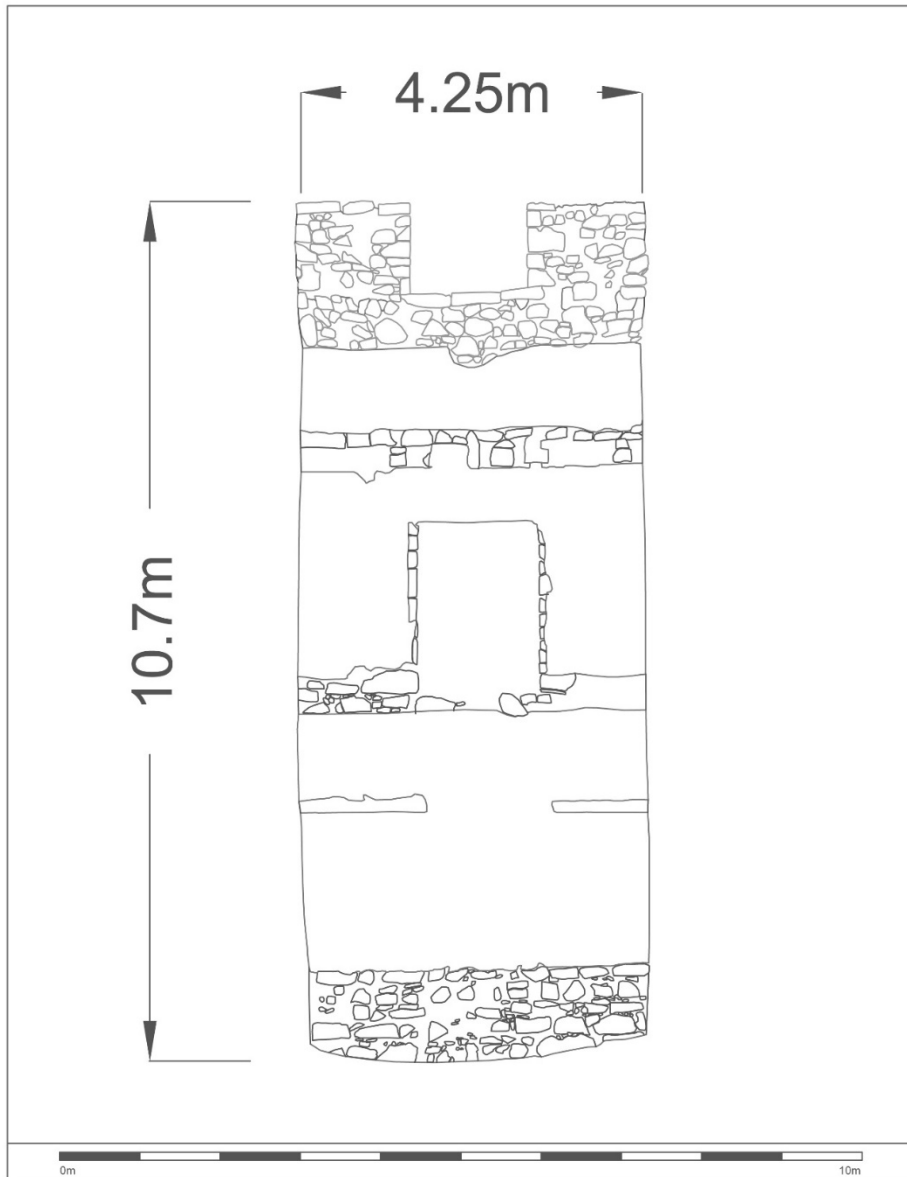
Internal elevation of the south-west wall of the signal tower at Golam Head Signal Station.
